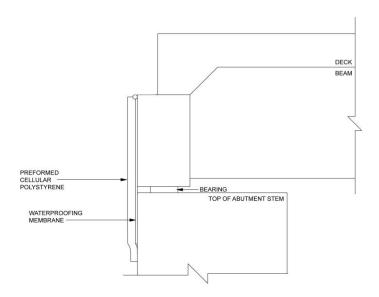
Waterproofing details similar to Little Creek Bridge
